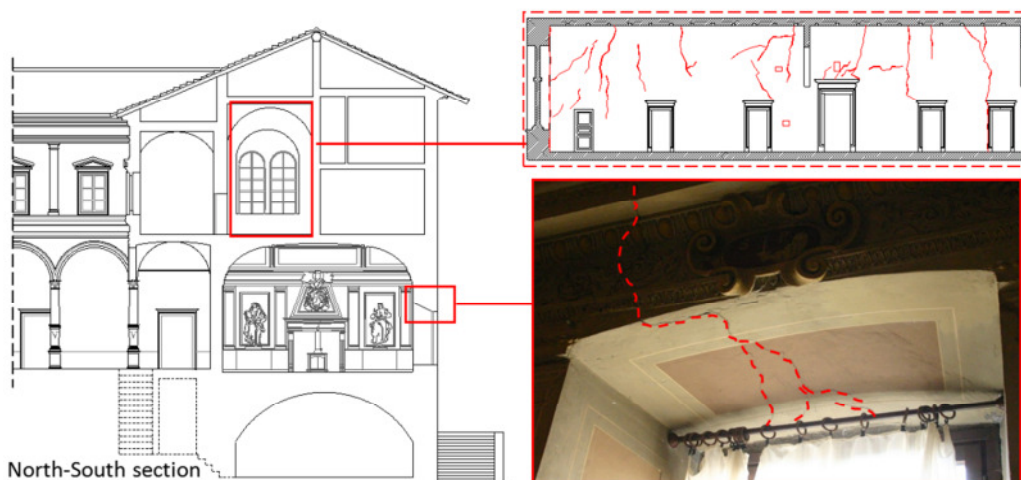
Crack pattern in the first floor corridor of the south wing of the building and in the refectory (layout by the author).
